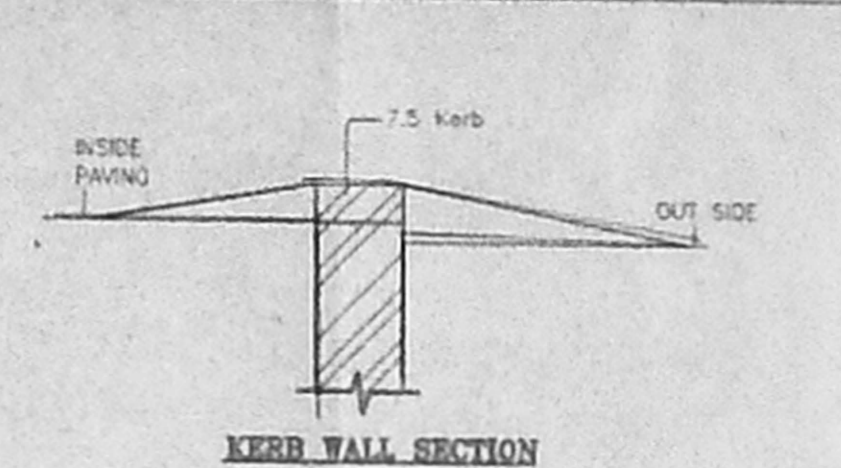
DETAILS OF COMPOUND WALL WITH RAIN WATER PRESERVING ARRANGEMENT
